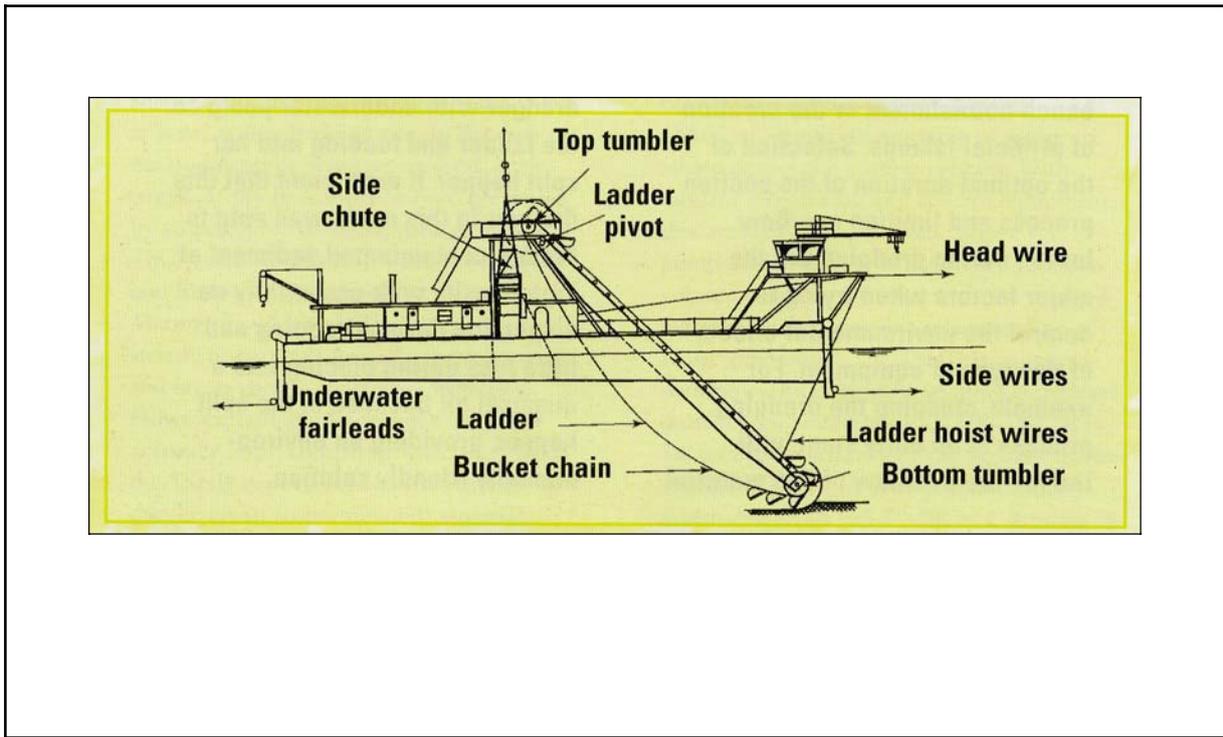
Schematic Drawing of Bucket Ladder Dredger (IADC, 1998)
